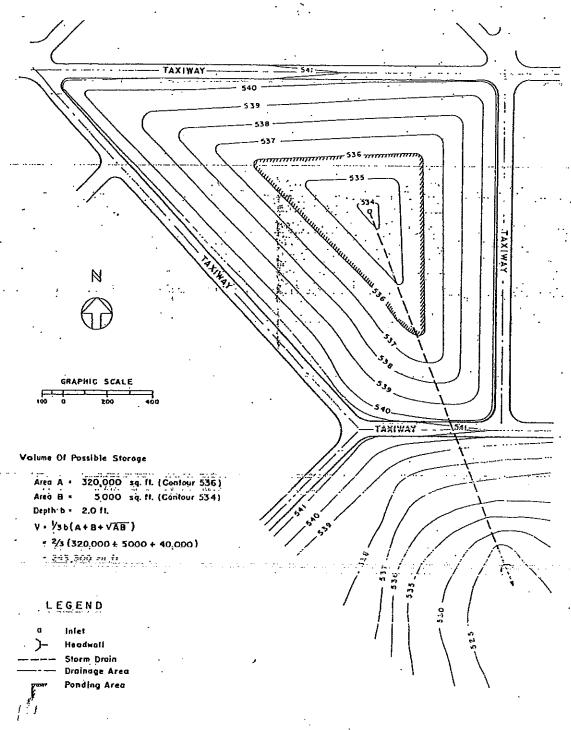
Example of providing for ponding area. (Source: Airport Drainage, FAA Advisory Circular 150/5320-5B, July 1, 1970.)
